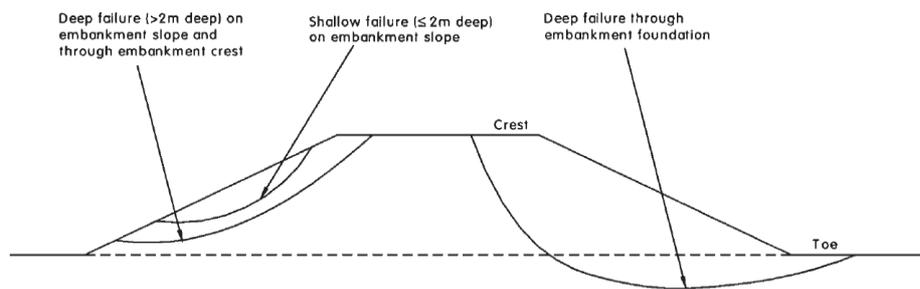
Examples of rupture surfaces for shallow and deep embankment failures [1]
